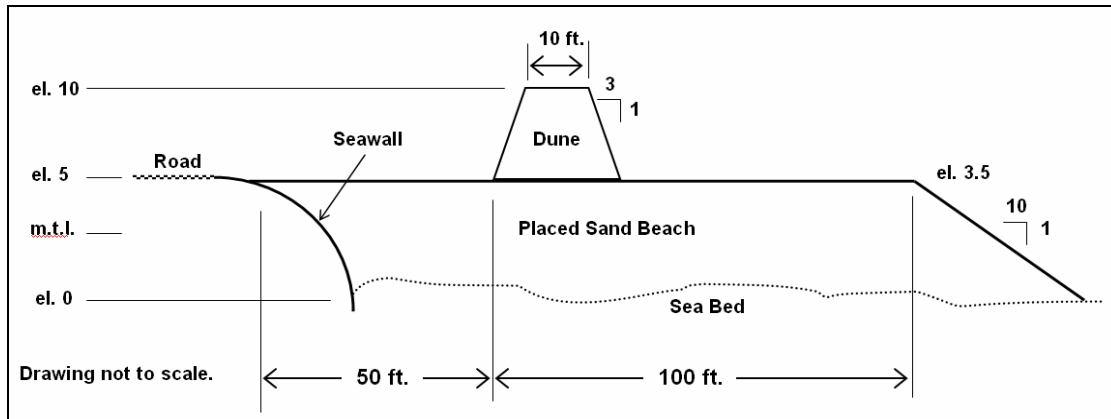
Elevation View, Alternative 2 and Alternative 3 (with Dune) Beach
